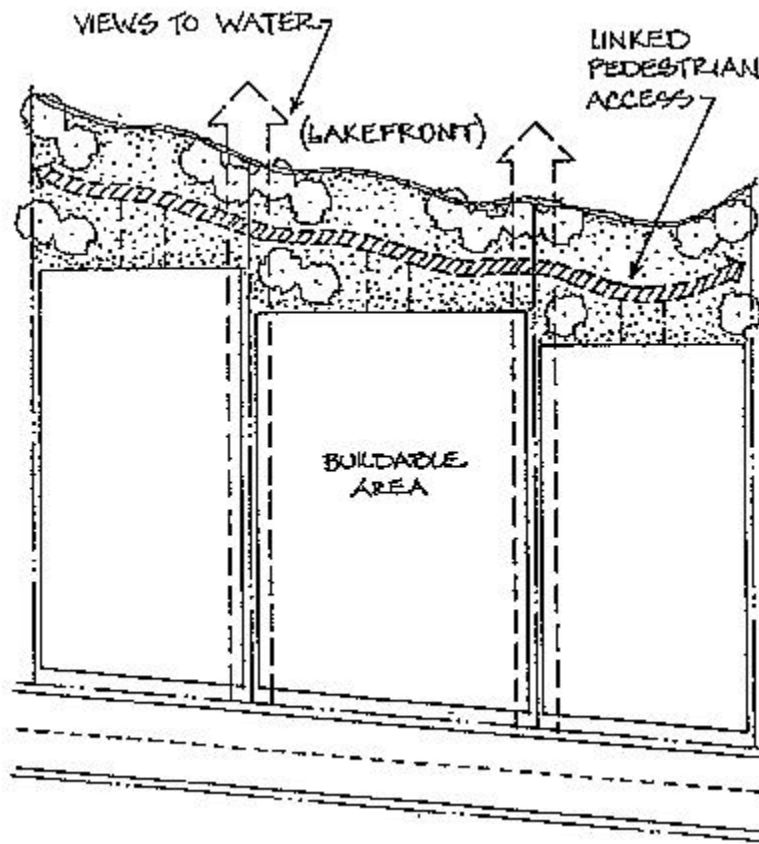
B – Examples of front yard open space elements.](#)
